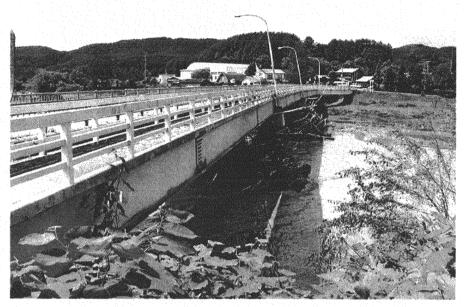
Damage to the pedestrian bridge over the upstream side of the Nukibetsu Bridge due to driftwood caught in the bride pier
